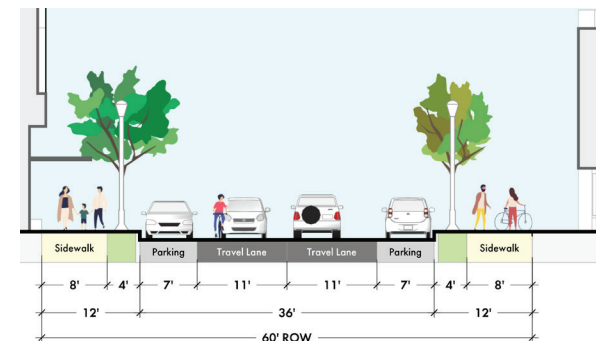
Street Grid- 60-foot Wide Right-of-way
